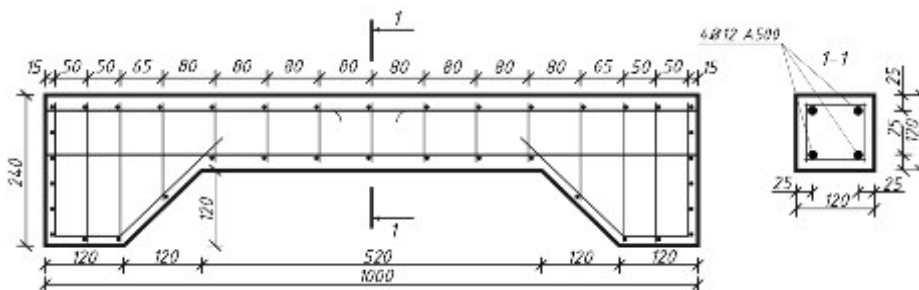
Scheme of reinforcement and geometrical dimensions of experimental samples (concrete columns)
